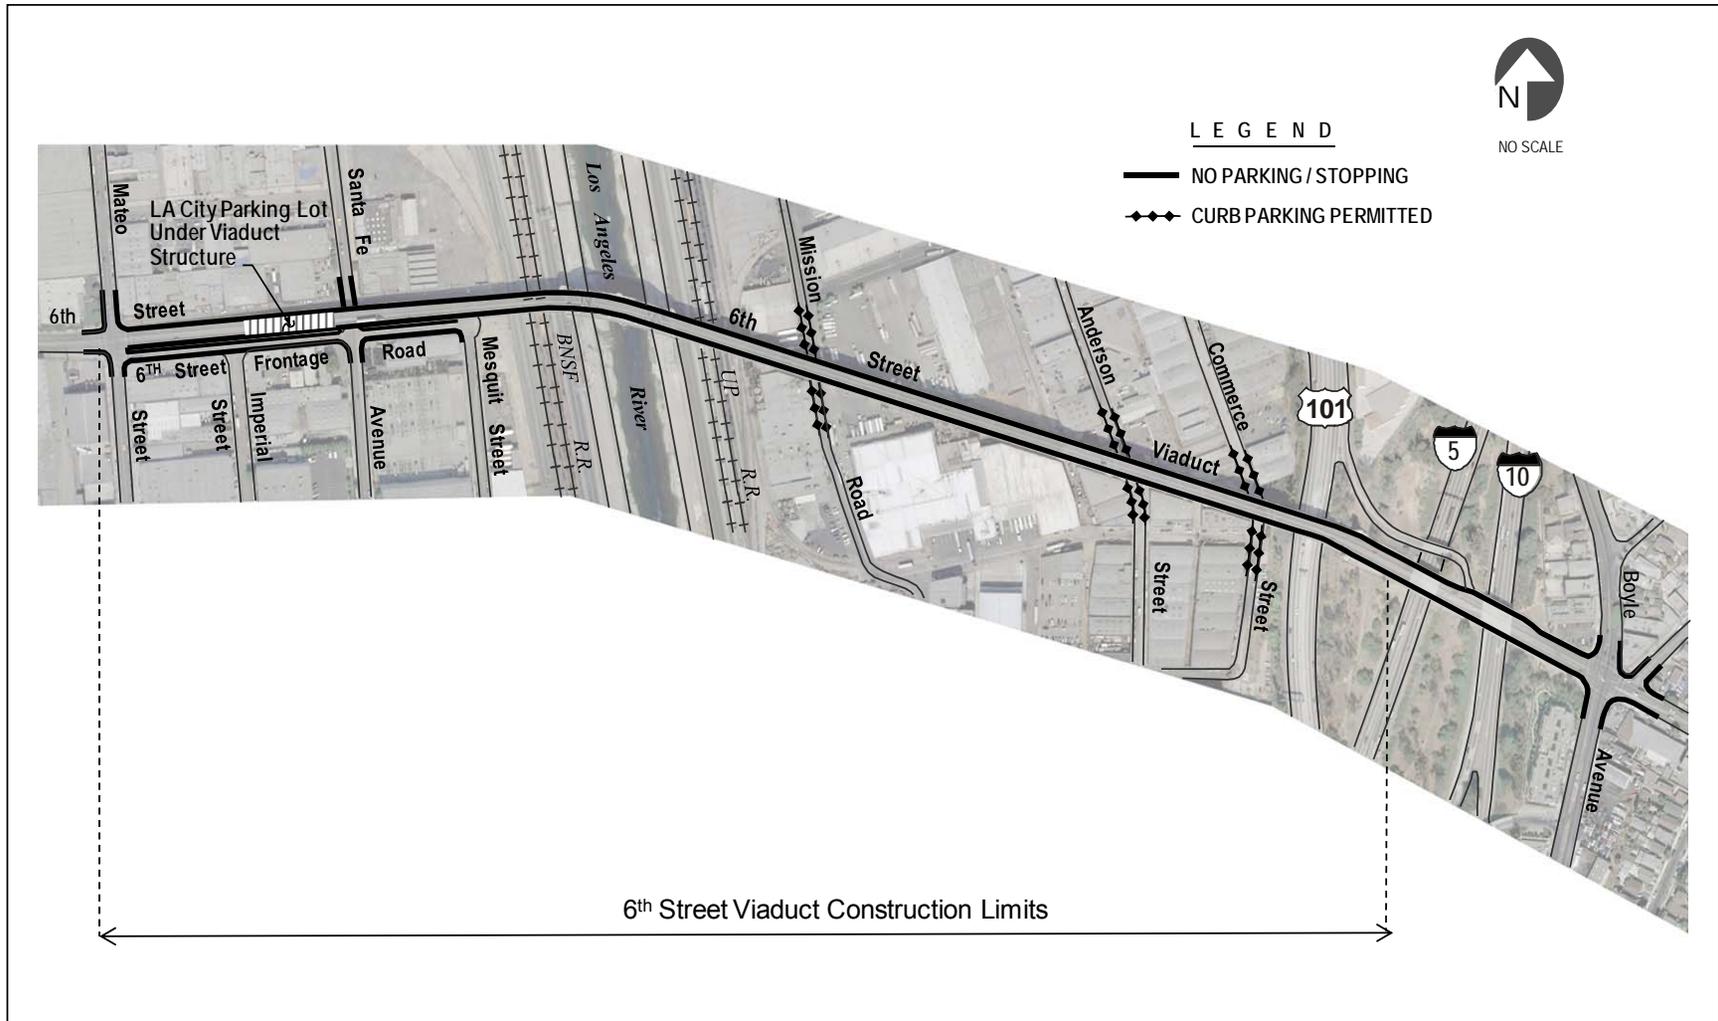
Parking within 6th Street Viaduct Construction Limits
